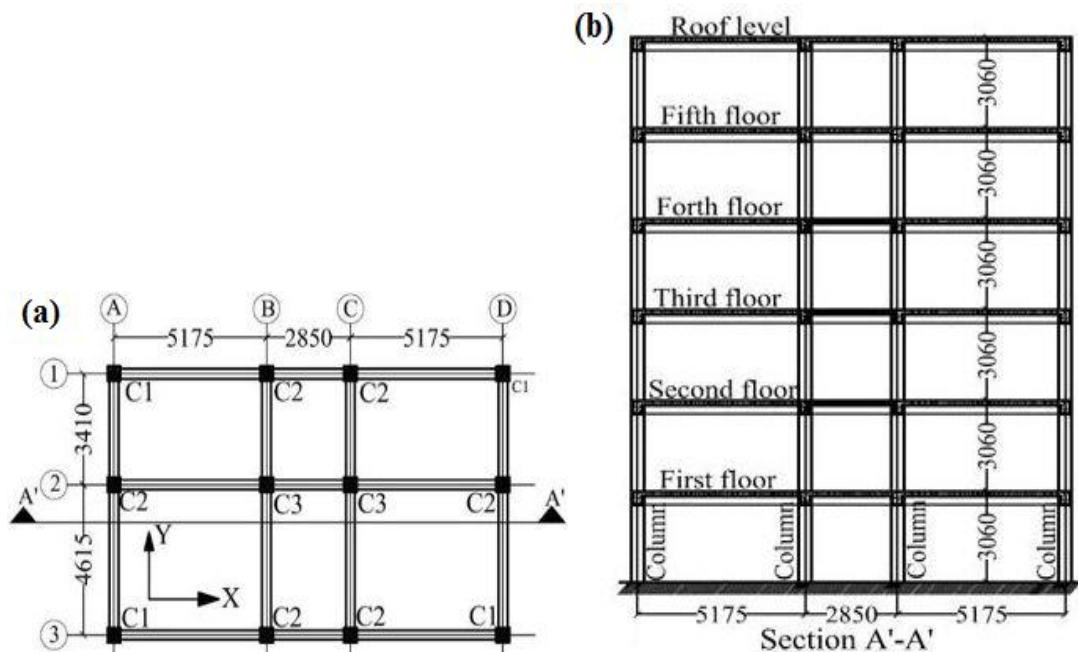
(a) Beam and column layout plan and (b) sectional elevation of 6 storey building.
